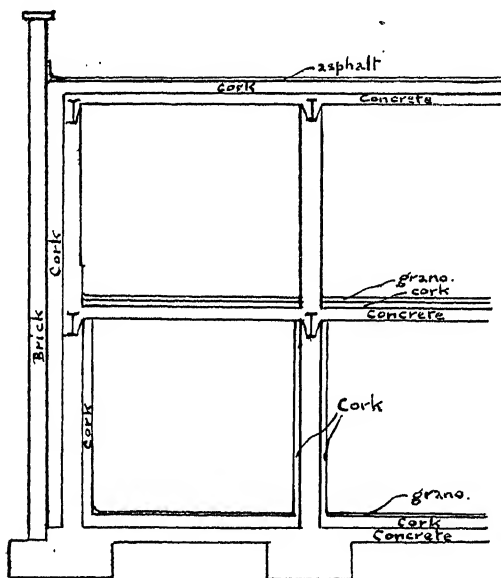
ENVELOPE TYPE OF INSULATED BUILDING
